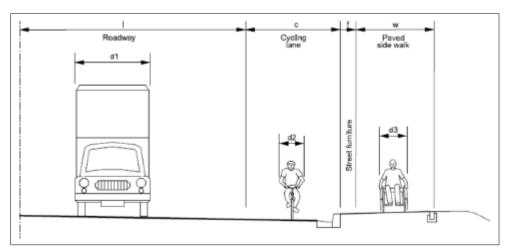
Typical cross section of a complete street with walkway/cycle track.
